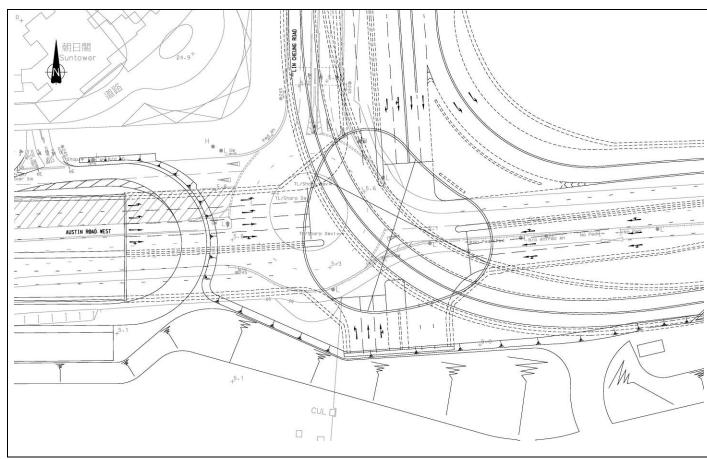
Planned Junction Layout of Lin Cheung Road/Austin Road West (J17)
